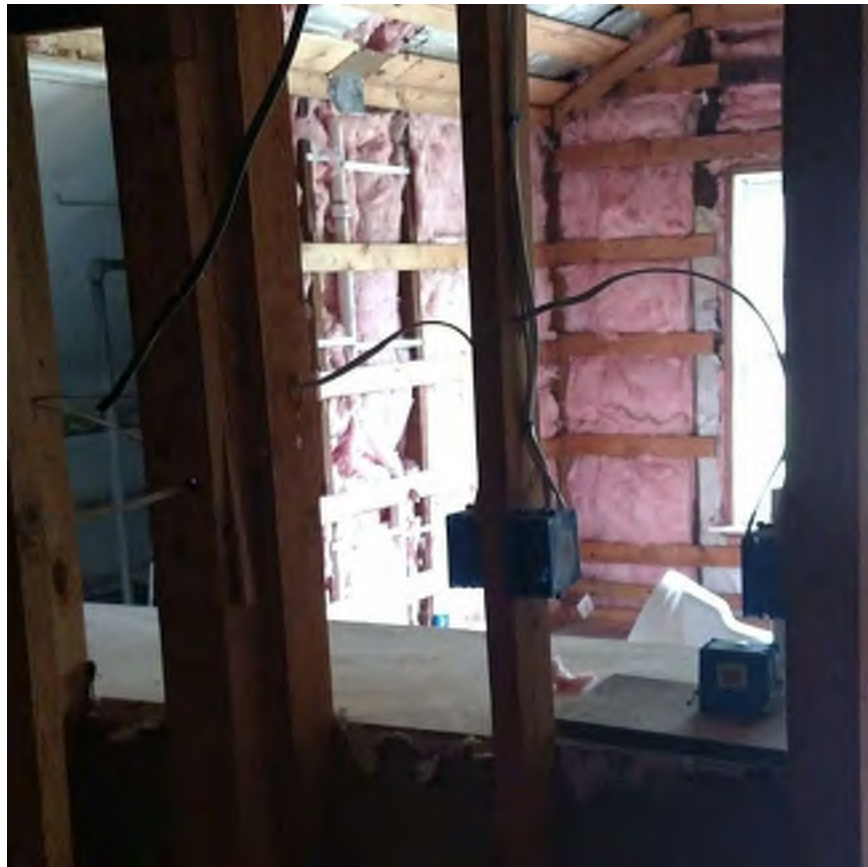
LN_RobertandEloiseCostnerHouse_halfstorybedroom_southelevation
